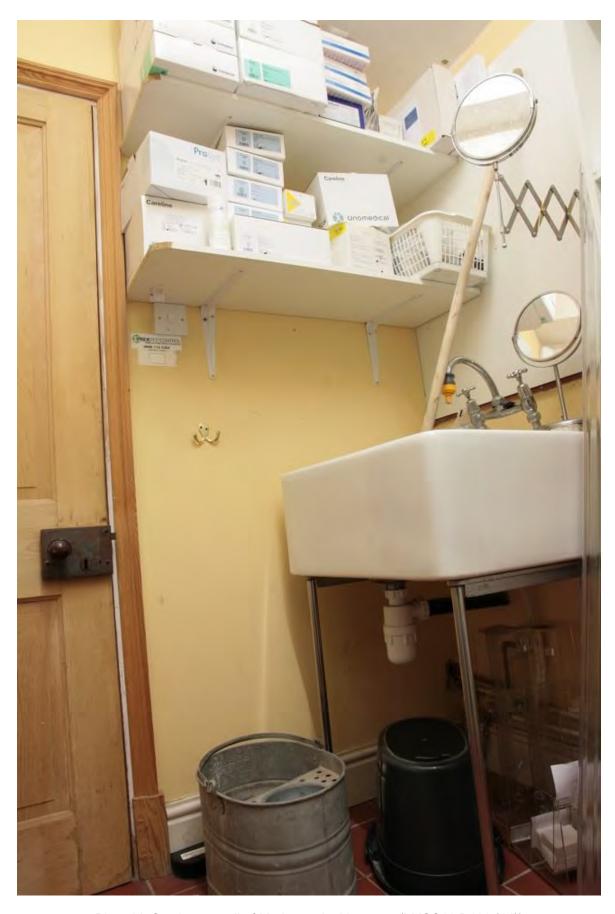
Southwest wall of Medstore, looking west (LMSC16 D100 (44))
